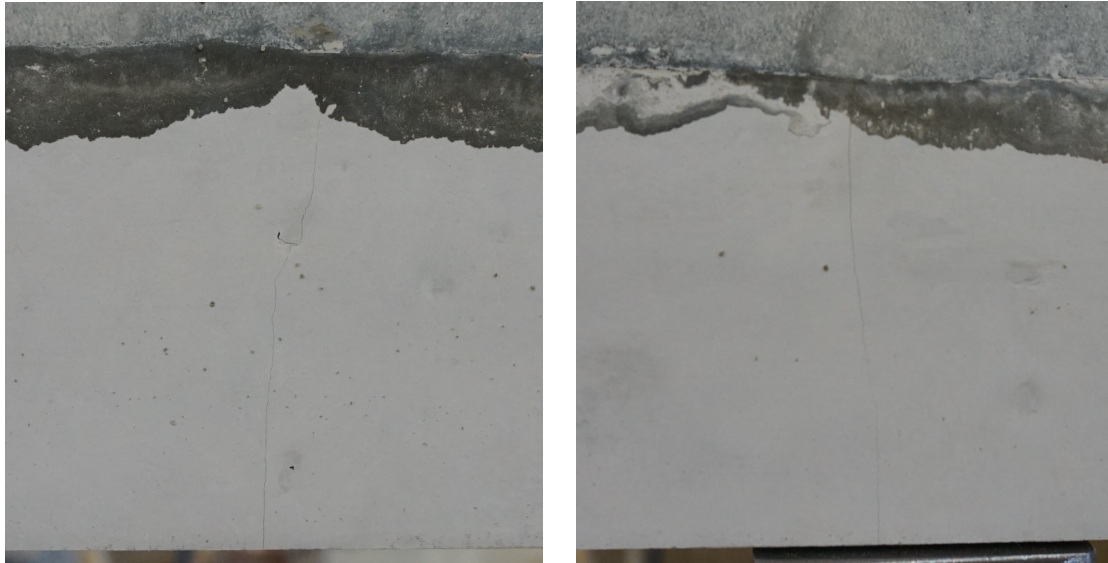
Shrinkage cracks on the SHCC layer of the beam with SHCC layer of 70 mm
